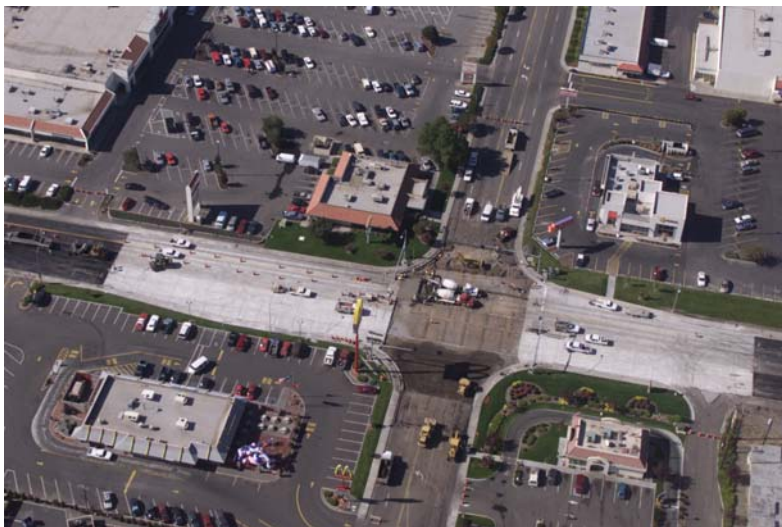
Aerial photo of Kennewick intersection, ready for concrete placement
